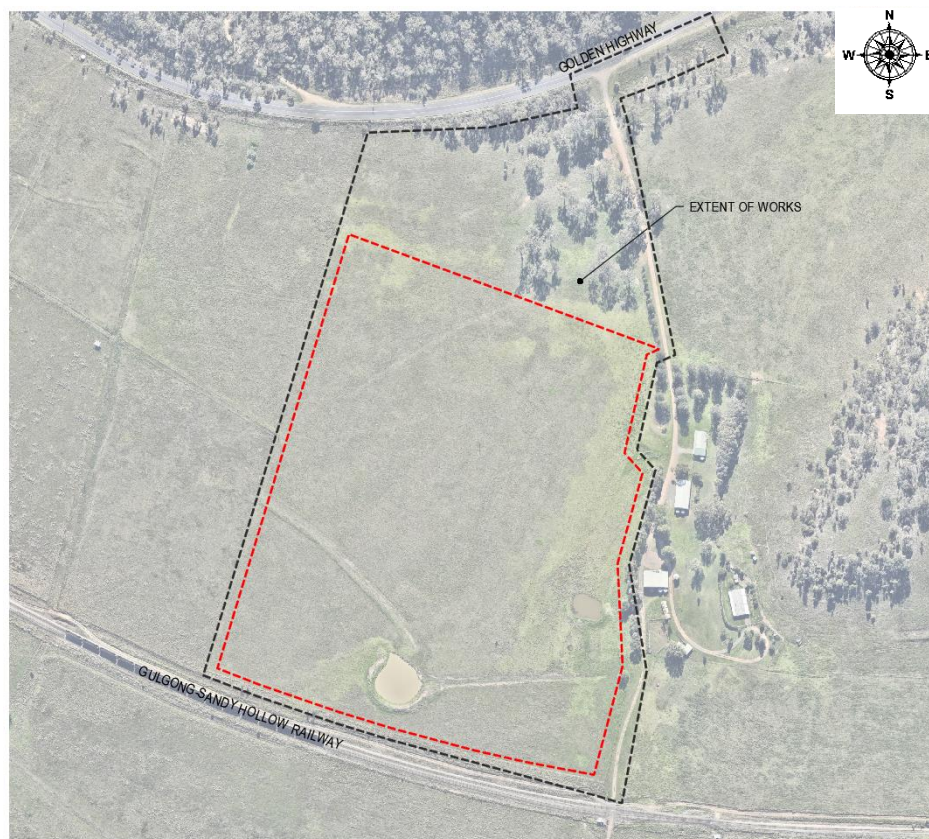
Site Location Plan (Source: Nearmaps 2023)
